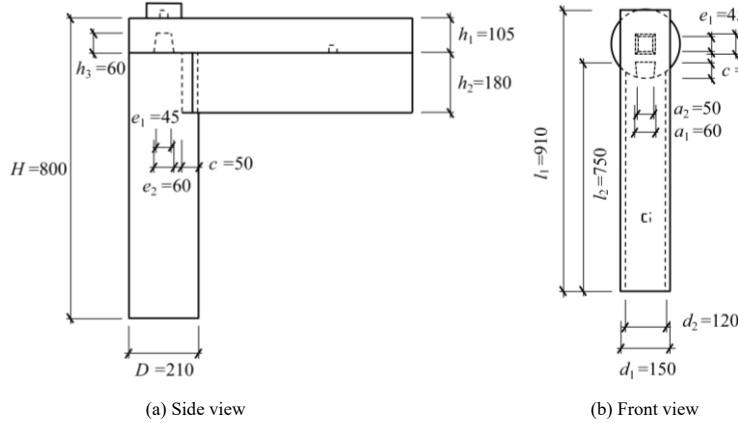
Detailed dimensions of Pu-pai Fang-dovetail tenon joint
